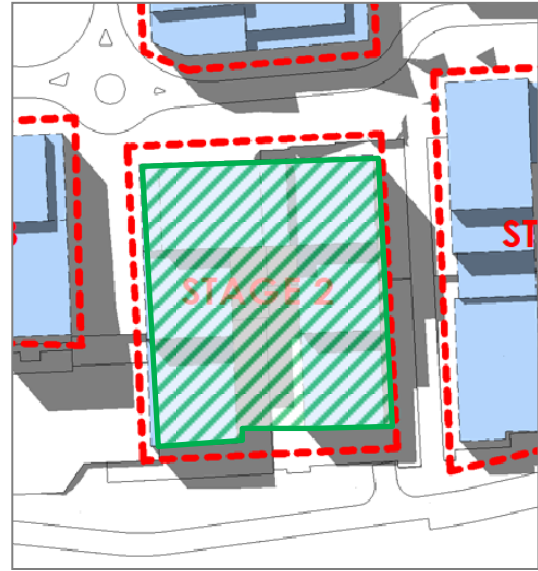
Demonstration of the basement parking level which is within the building footprint, and also the internal courtyard of the 'u-shaped' building.
